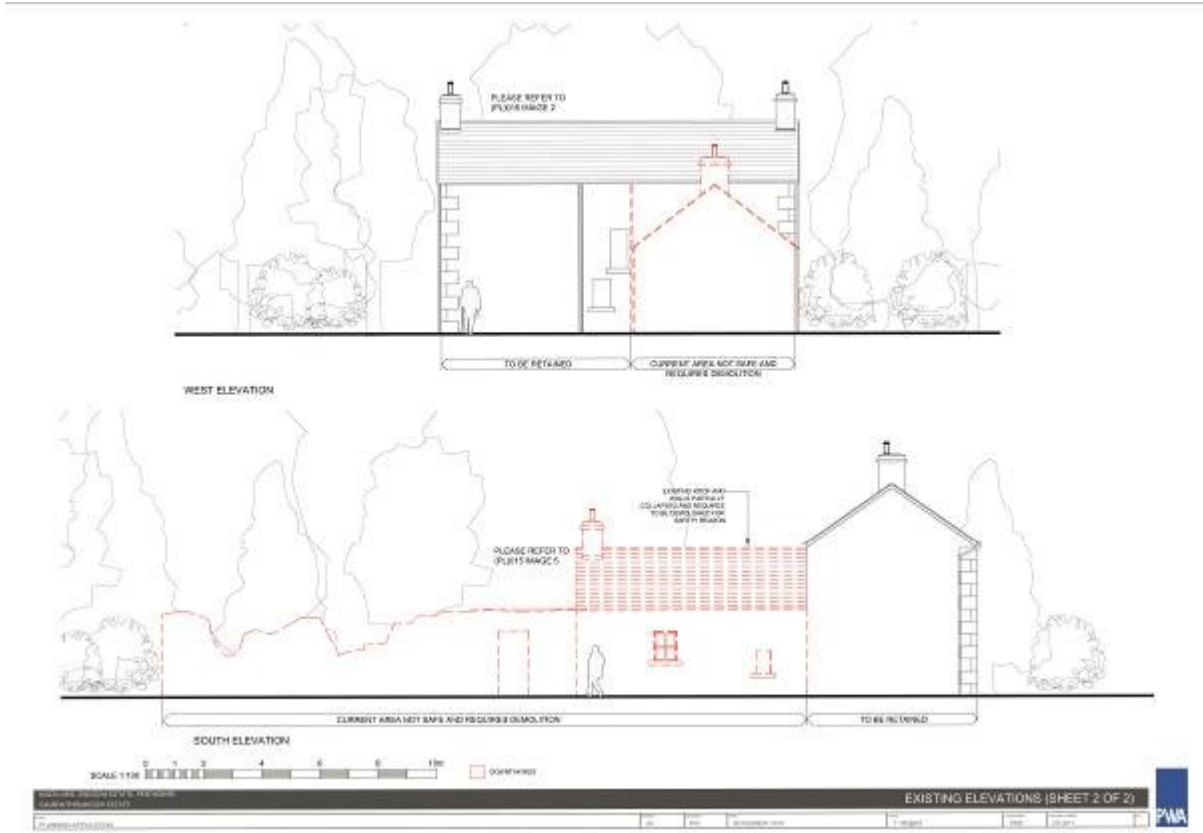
Elevations of Buildings 1, 2 and 3 at Mucklarie Farmhouse (based on supplied architects drawings)
